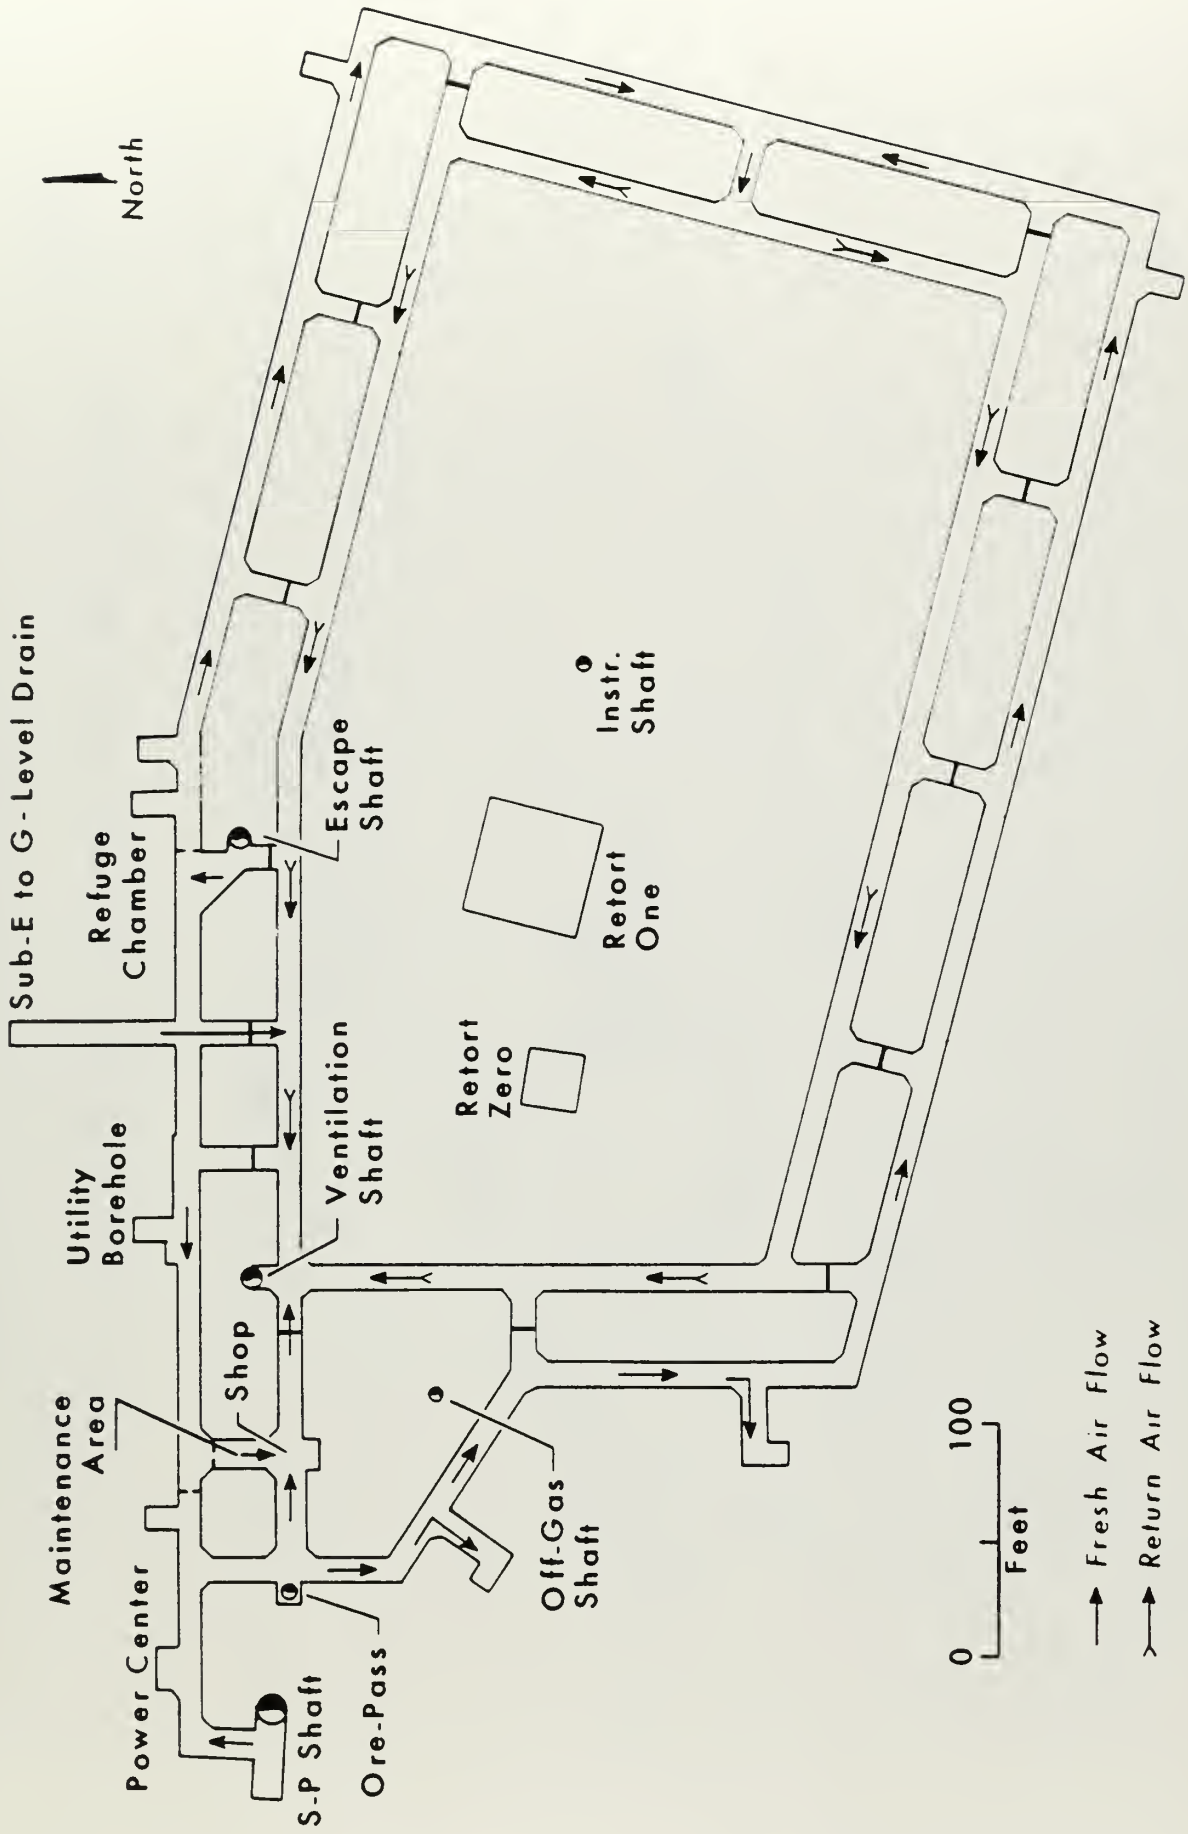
Sub 'E' Level Design and Ventilation Plan (Inactive)
